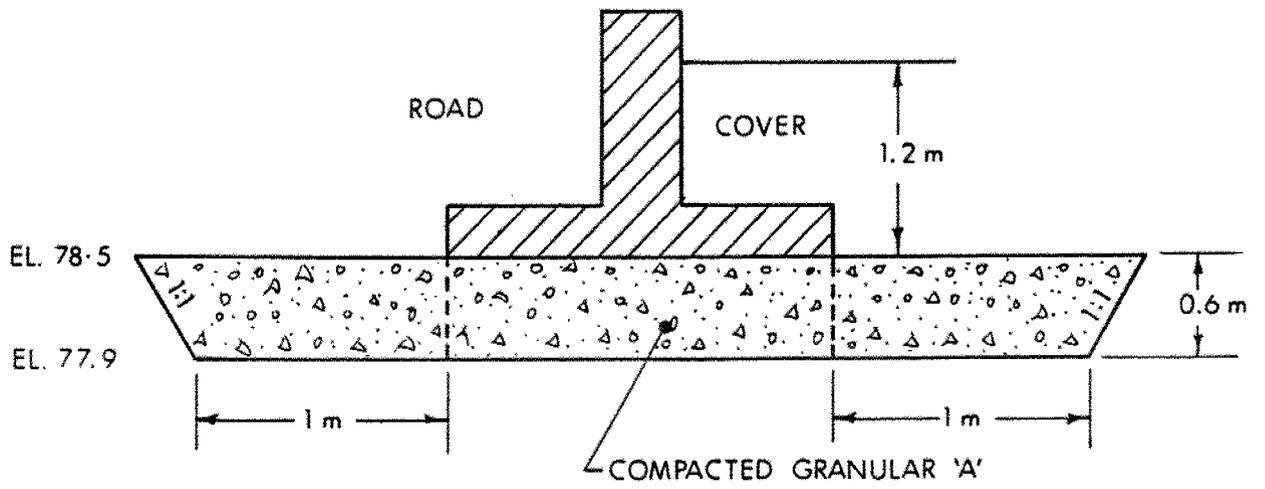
RETAINING WALL ON SPREAD FOOTING (sta.0+310 to sta.0+315)
